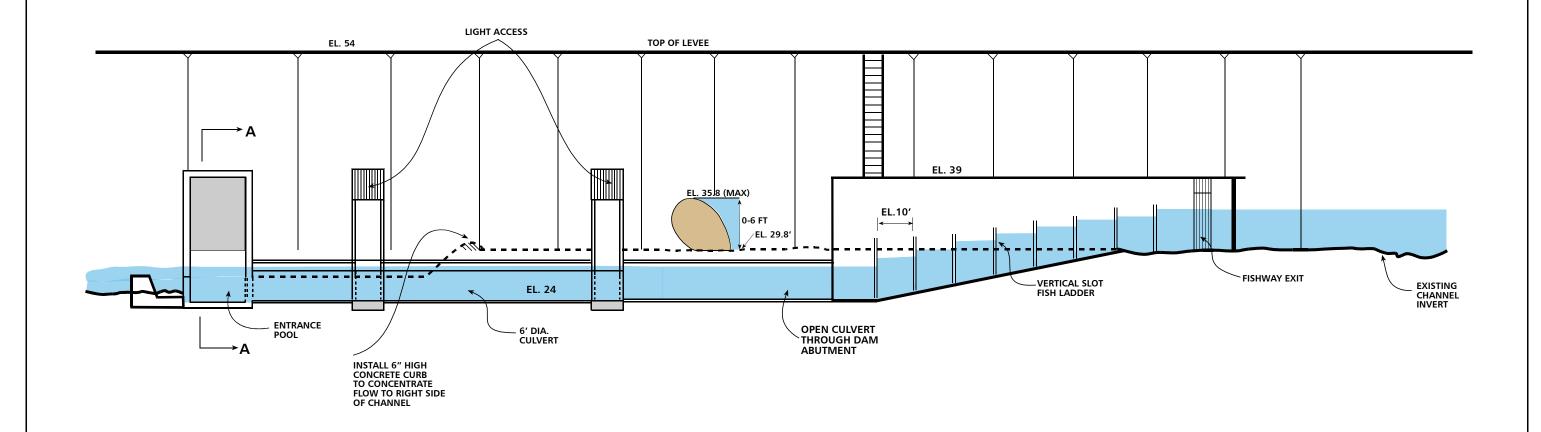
Elevation Proposed Fishway at the Lower Inflatable Dam Alameda Creek Fish Passage
